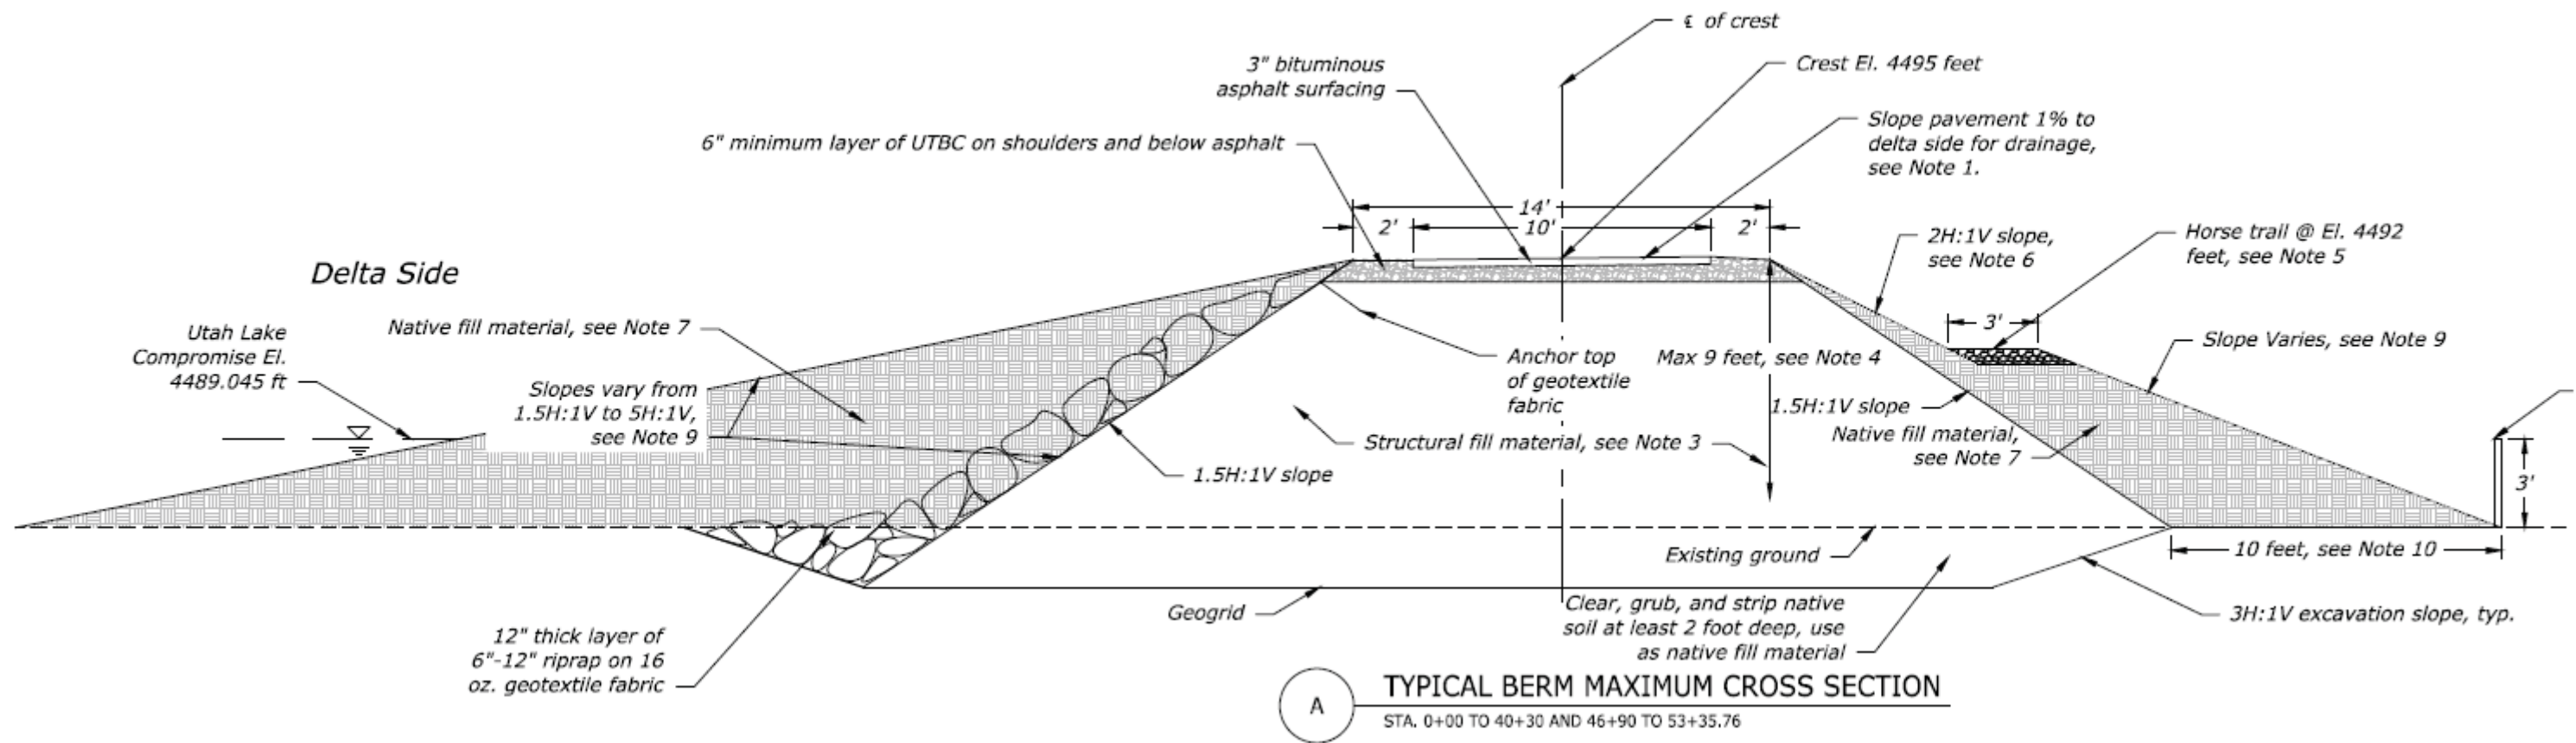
Typical cross-section view of the new berm with trail, including structural details. (Drawing from BOR 60% plan set).
